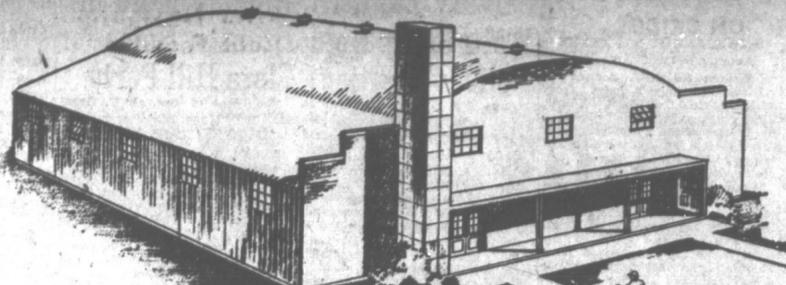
EXHIBIT BUILDING—Shown above is an artist's conception of one of two exhibit halls proposed for Fair Park at Pampa if next Tuesday's \$150,000 county bond election passes. Each building will have about 16,000 square feet of floor space and will be of concrete and steel construction. Another building of like size is contemplated in the program for livestock displays.
